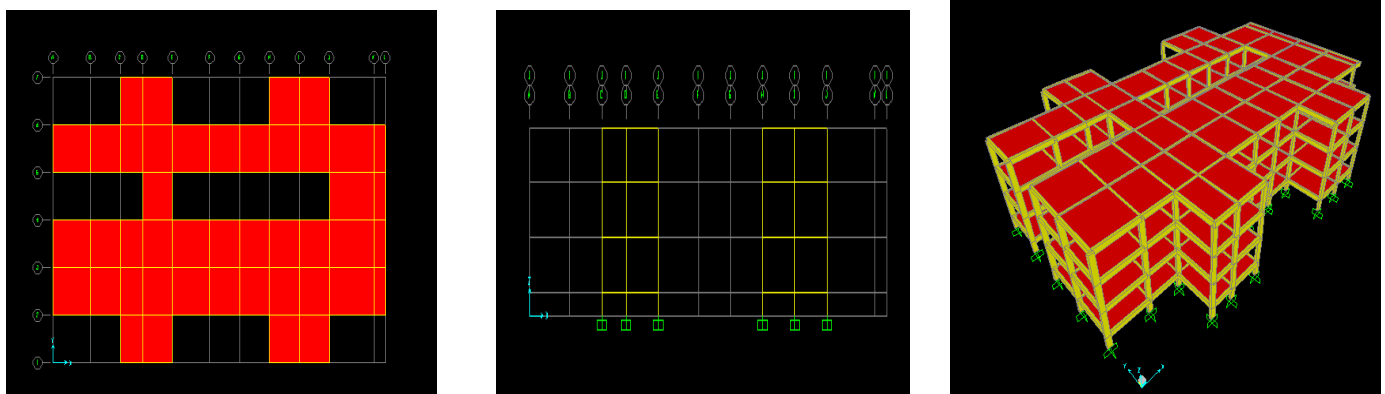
Plan, Elevation and 3 D View (MODEL 2)
